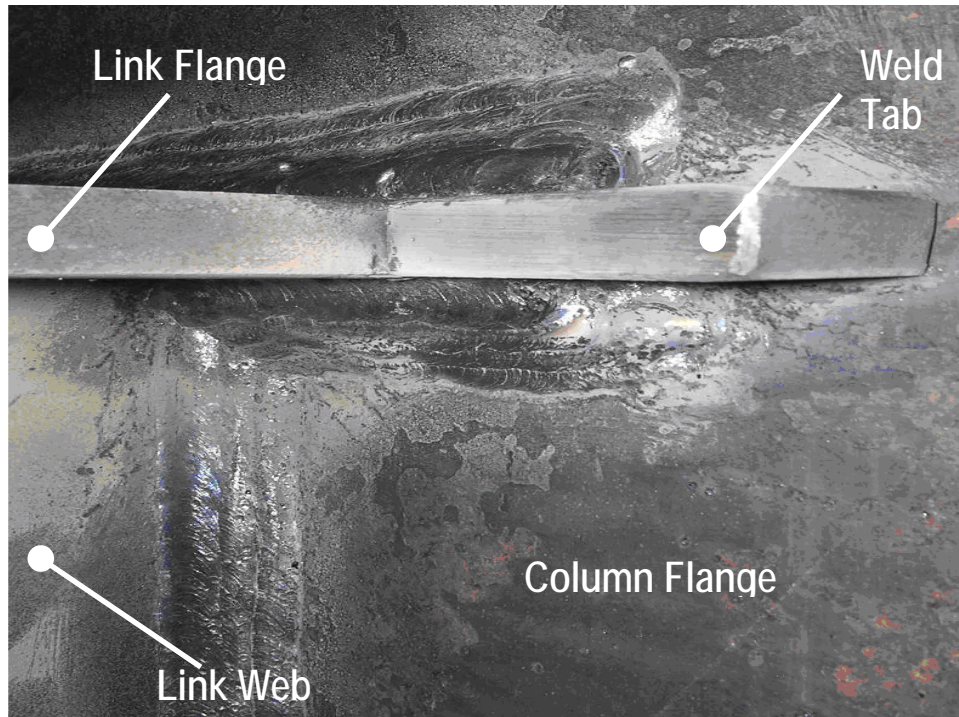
Fillet welds of the link flange and web to the column flange in AISC-1
